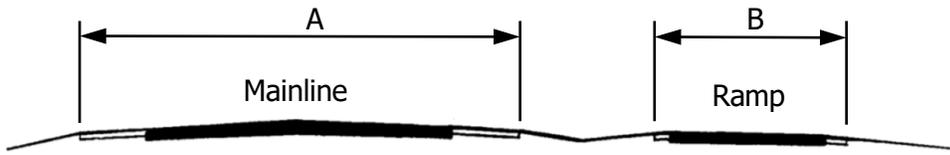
Approach roadway cross-section view for a mainline and a ramp that are carried across one bridge.
